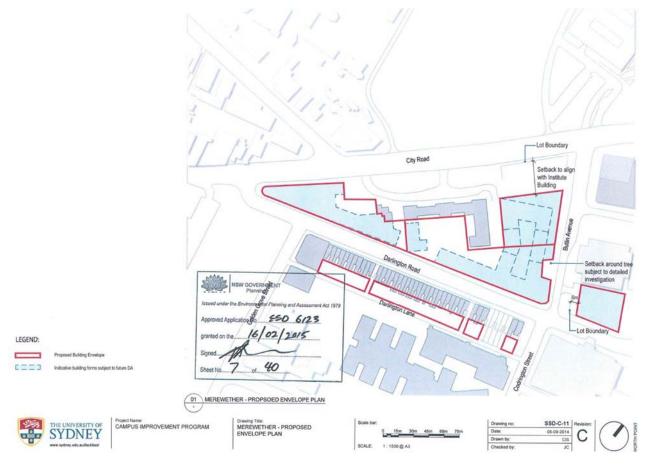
Merewether Precinct – Proposed Envelope Plan
